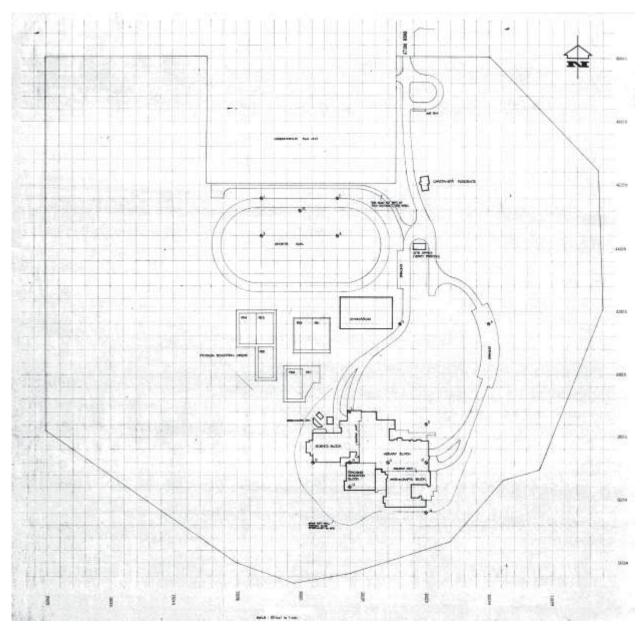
William Balmain Teachers College Stage 1 – Site Plan (sheet number 4)
